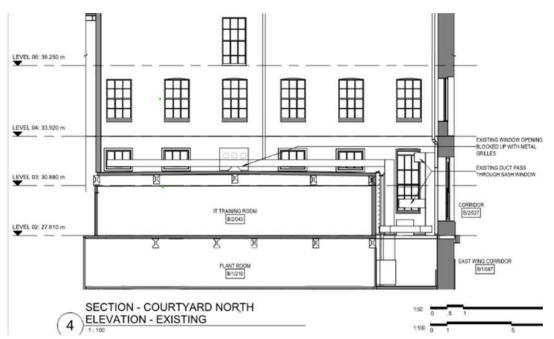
EXISTING COURTYARD NORTH ELEVATION — EXISTING DUCT ROUTES
